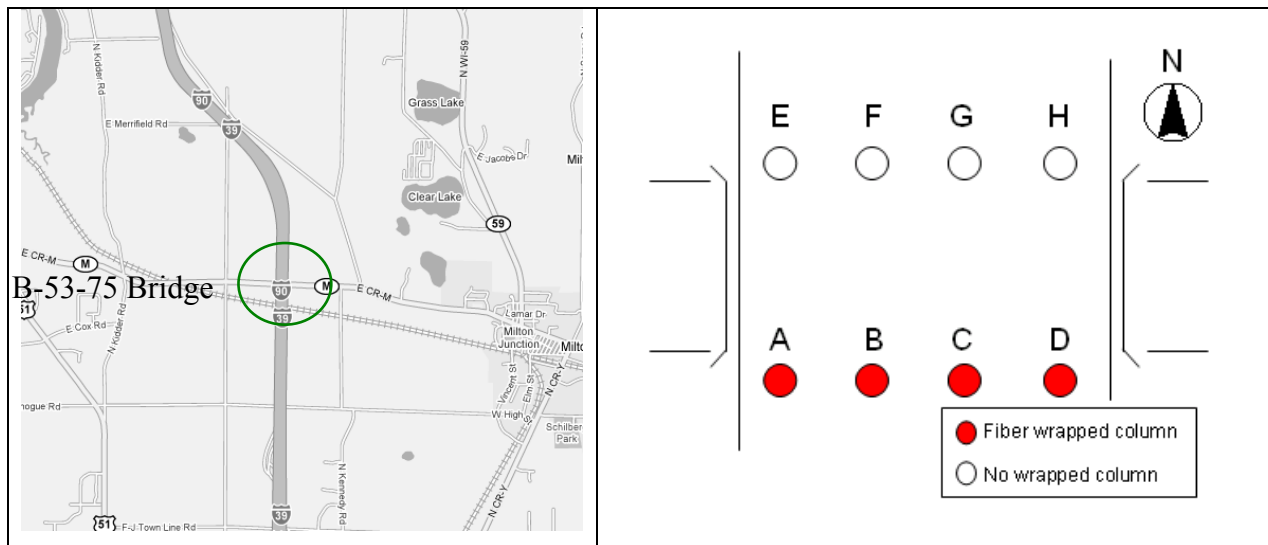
Location of B-53-75 bridge in Rock Co., WI and arrangement of columns (map: after Google Maps 2008).
